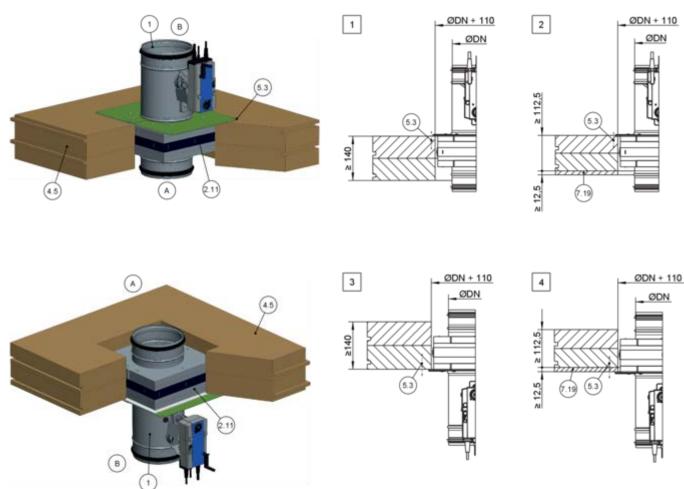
Dry mortarless installation with installation kit TQ2 into solid wood ceiling, upright and suspended
